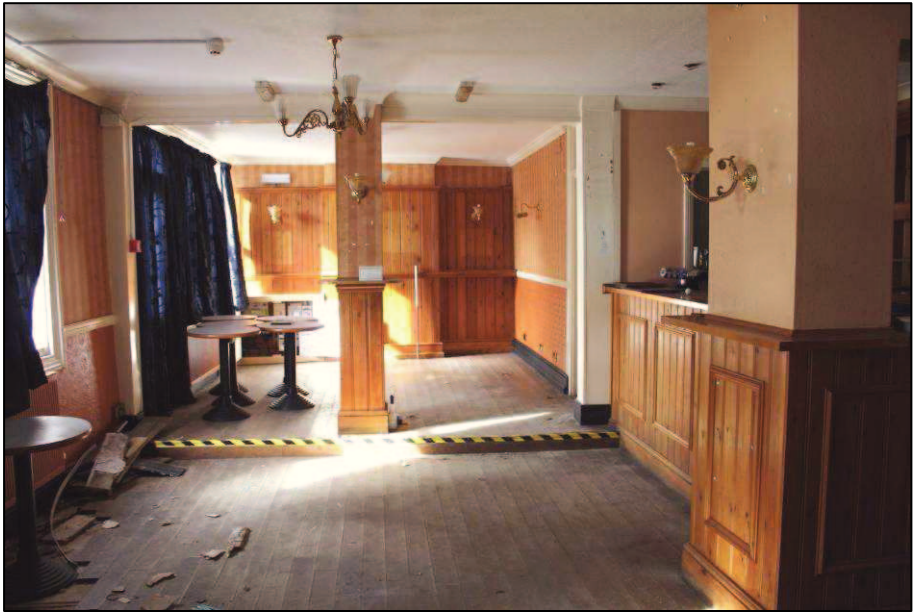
(Shot 13): General view of the pub area, looking southwest, 1m scale
